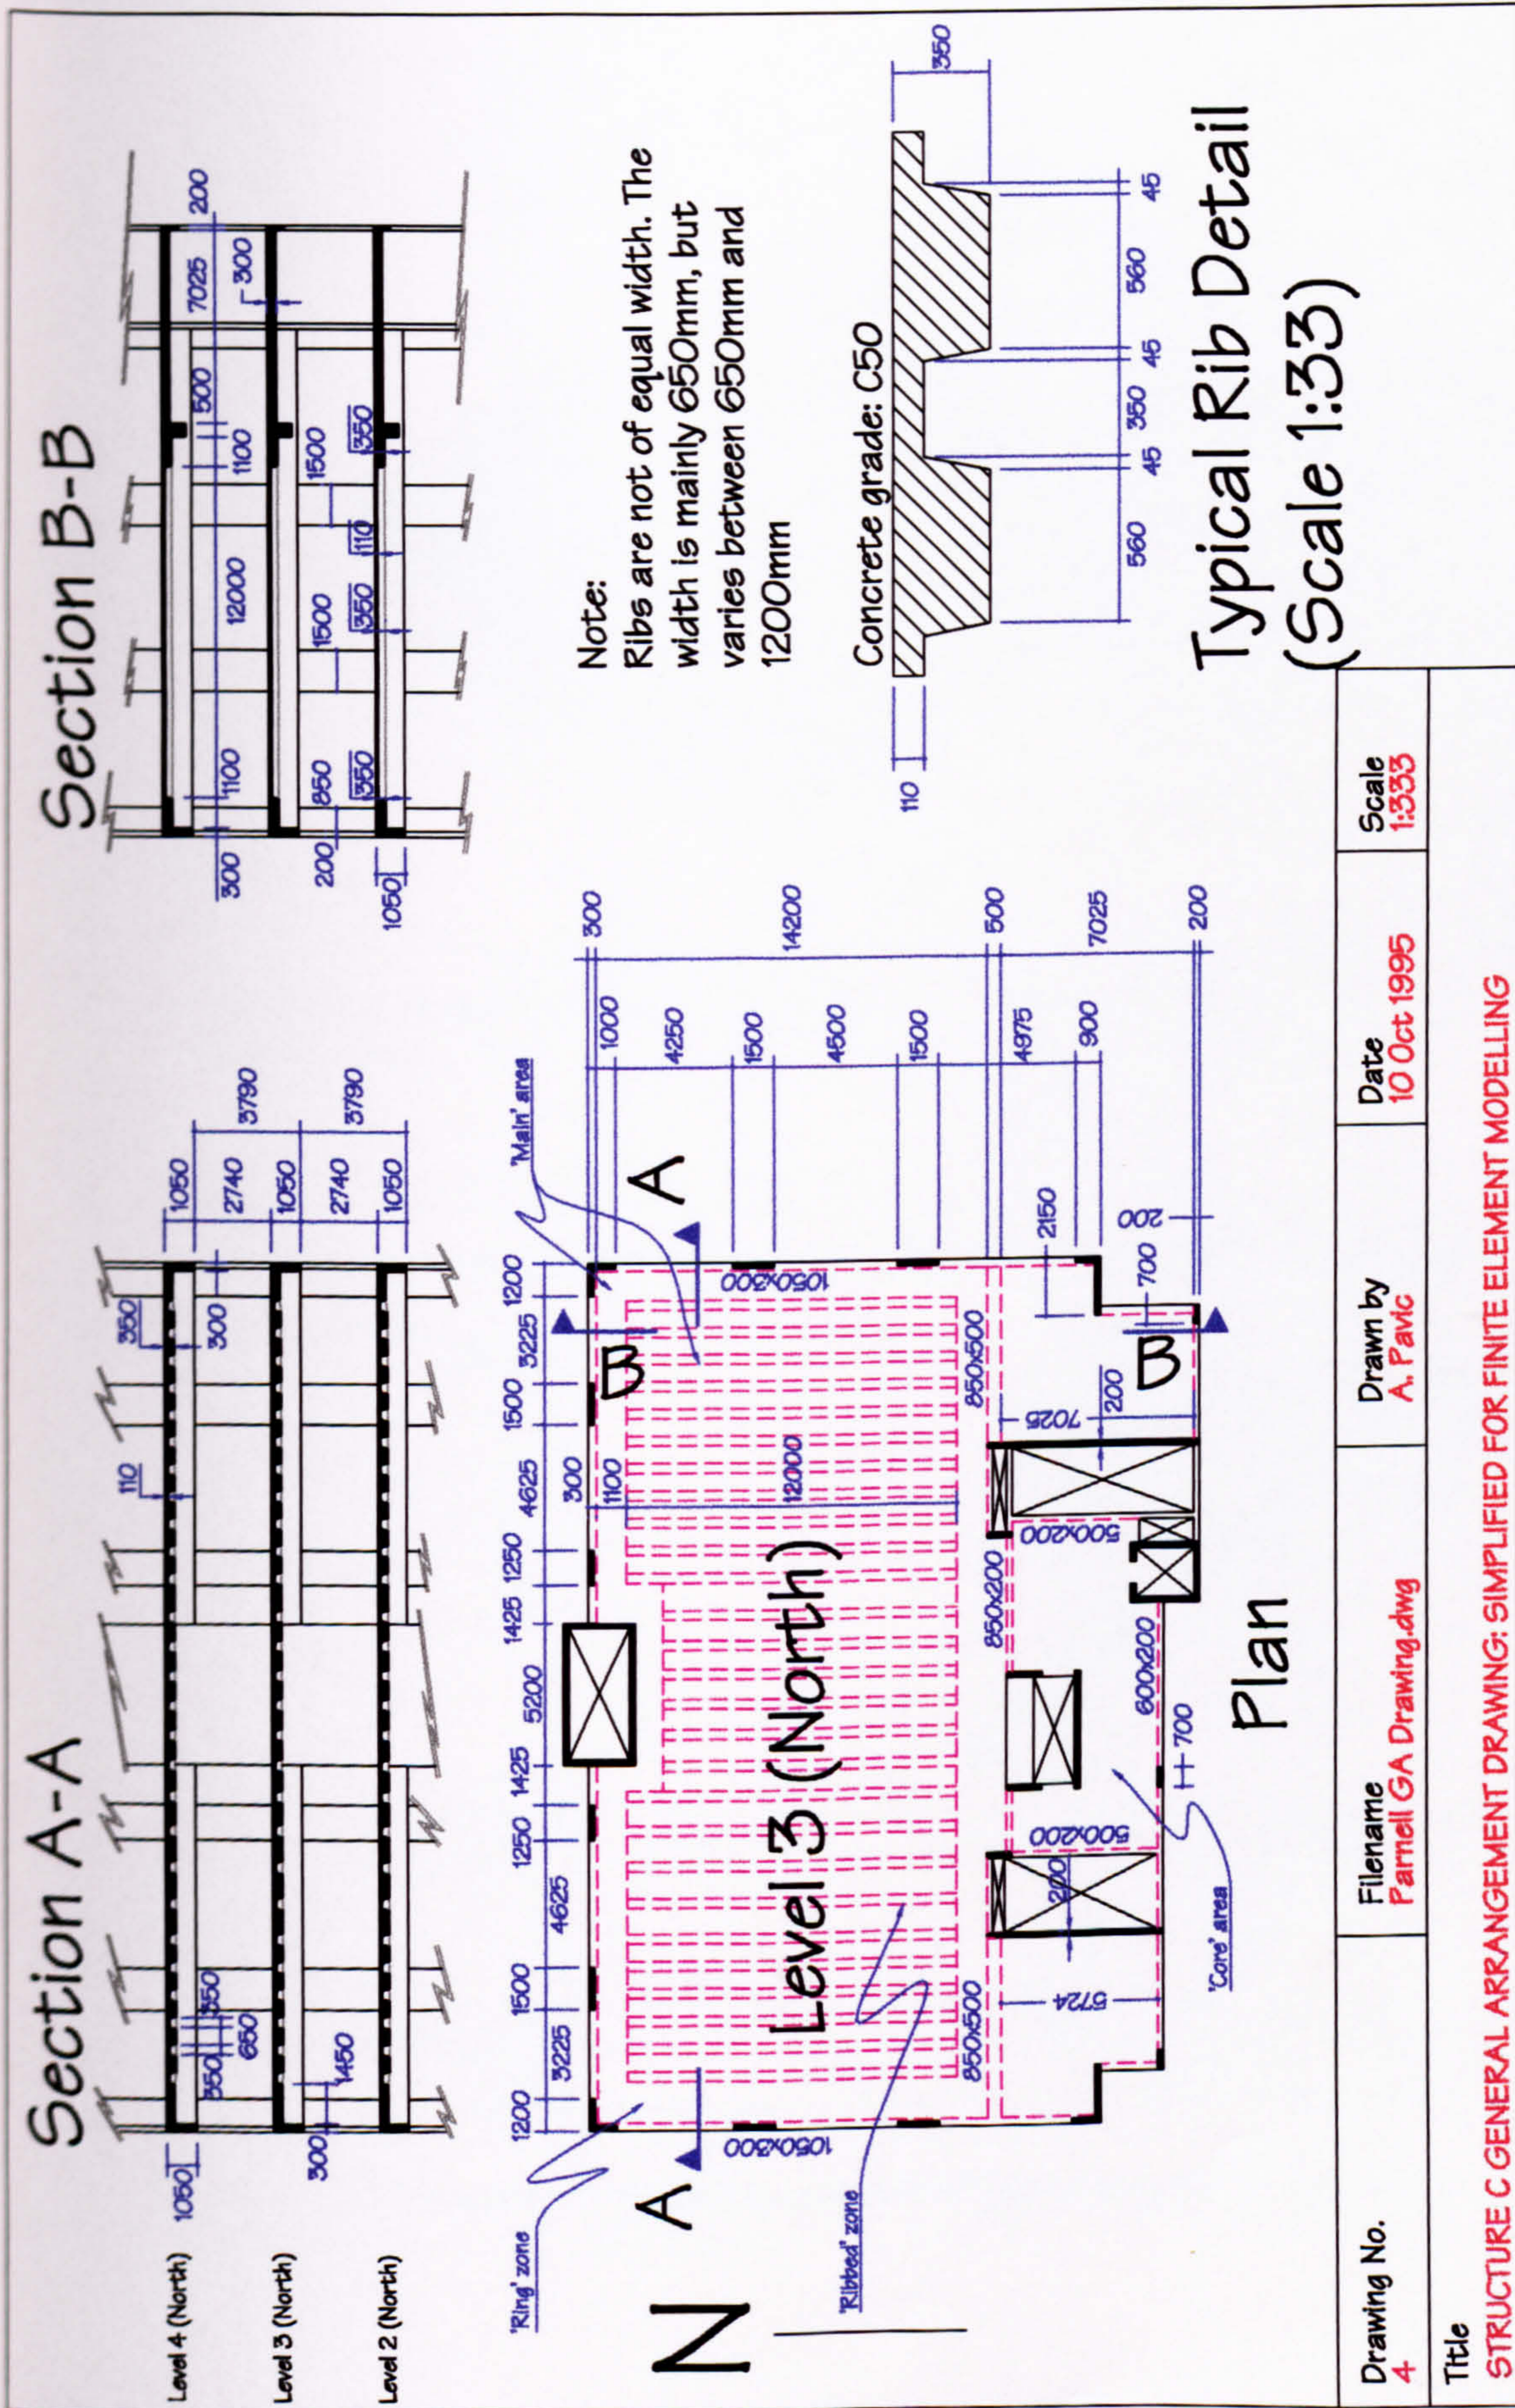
Structure C - Layout of in-situ cast post-tensioned concrete floor.
